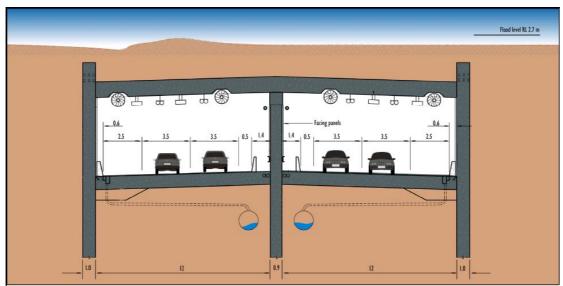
Typical cross-section of the road tunnel within the Gold Coast Airport
